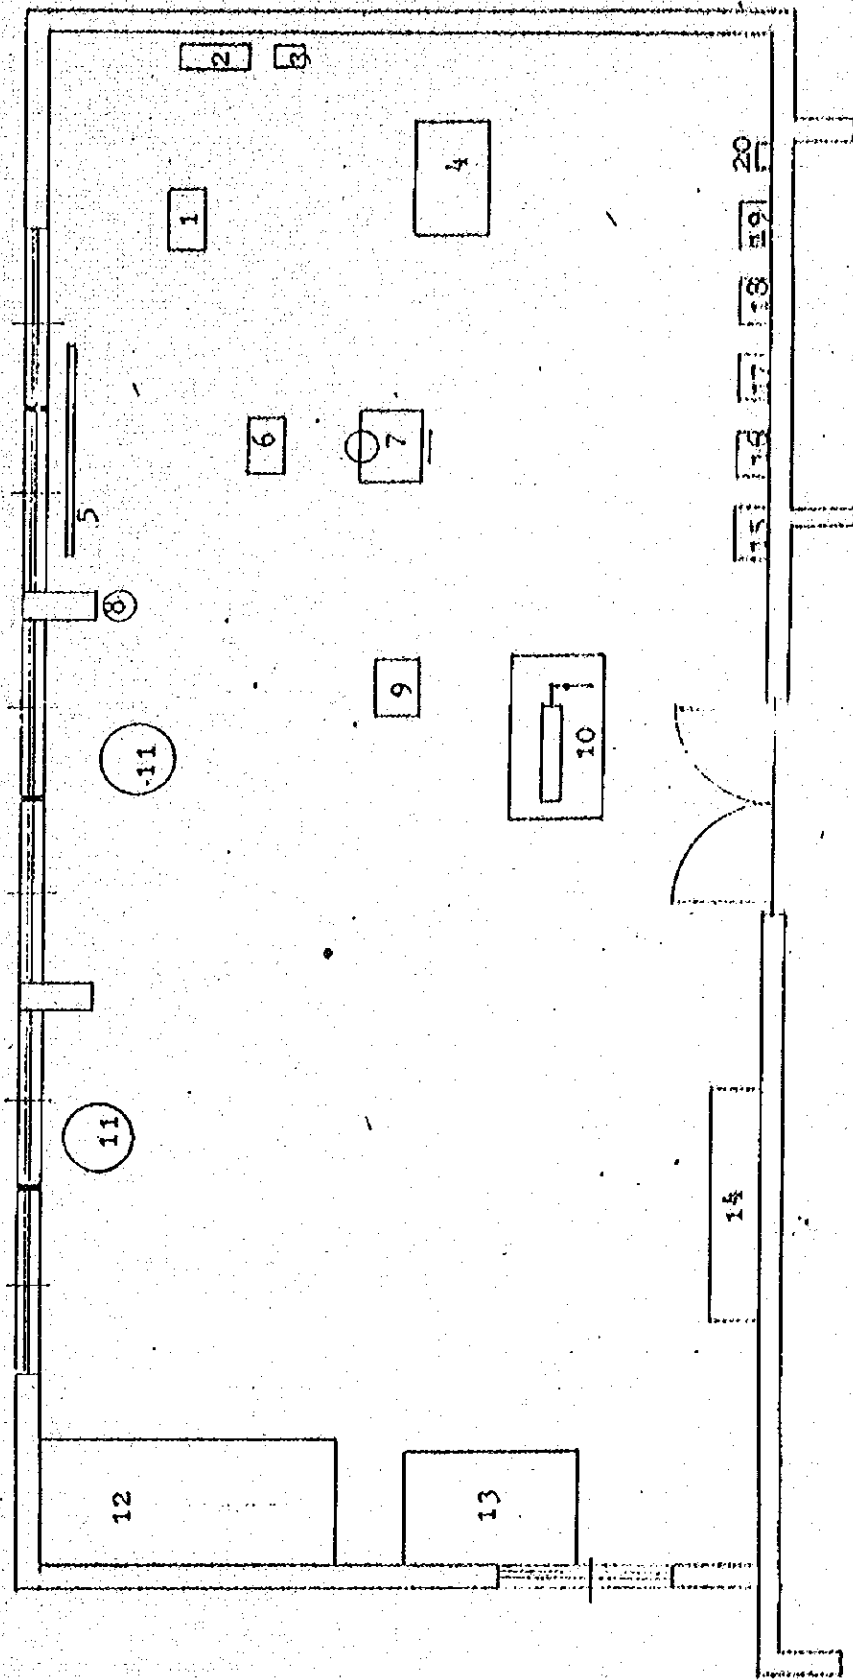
General Arrangement of Navigation Equipment Room in SSIC Educational Building
